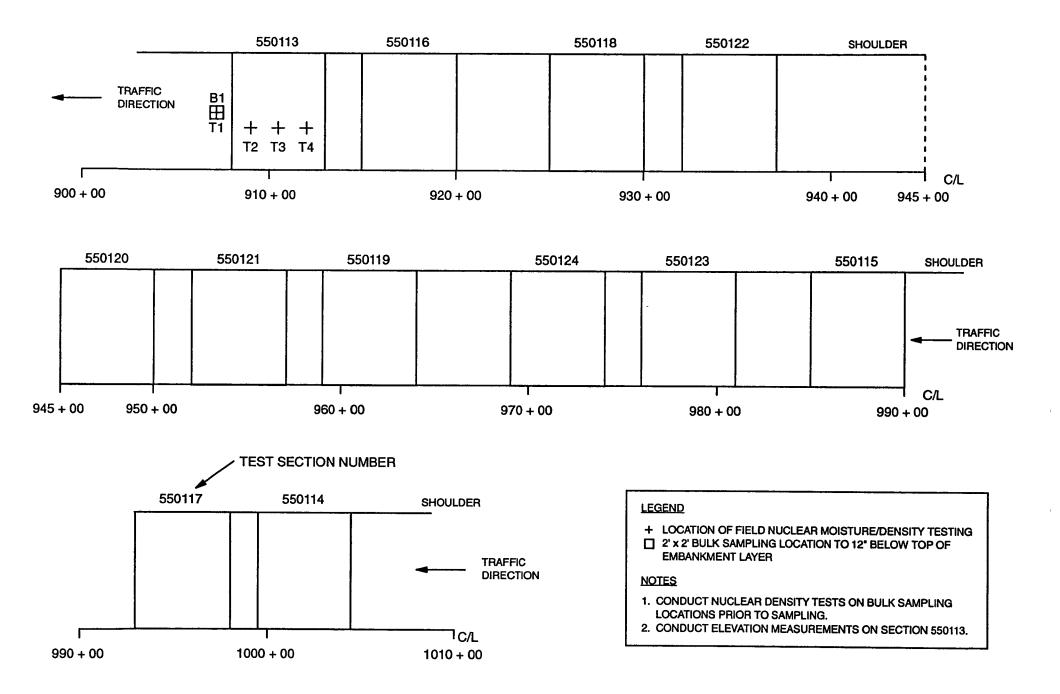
Overview of Sampling and Testing Plan for Embankment (Fill).
